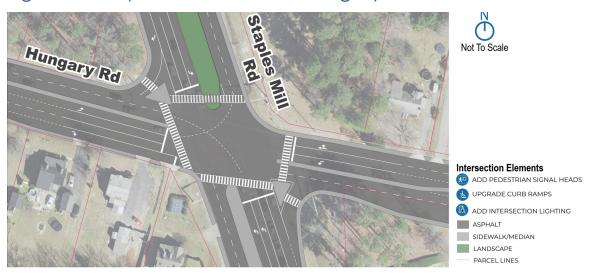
Staples Mill Road and Hungary Spring Road Alternative
